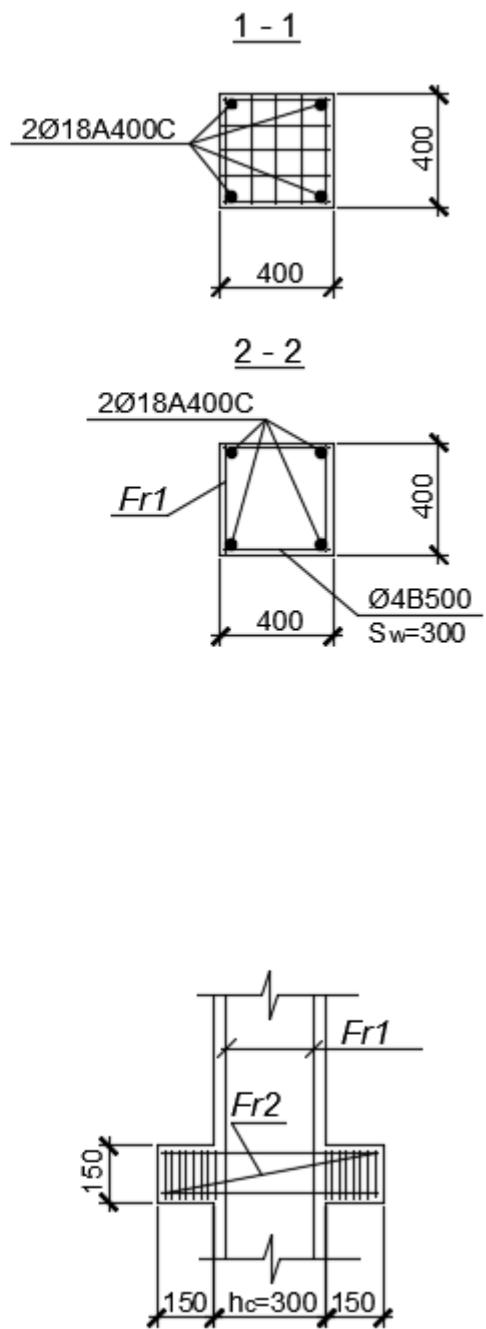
The pattern of the reinforcement of the column console of a civil building
